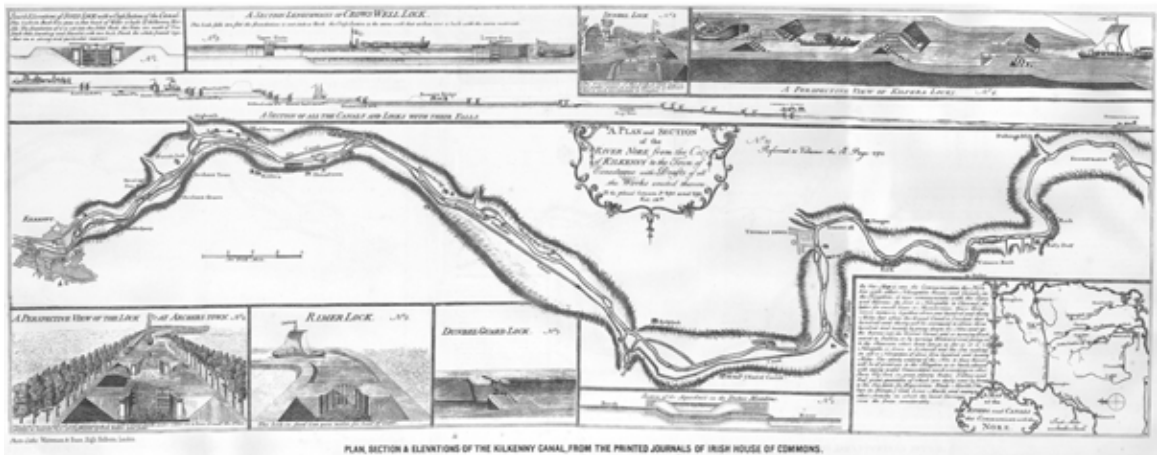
Plan of the Kilkenny Canal from the Journal of the Irish House of Commons [41]
